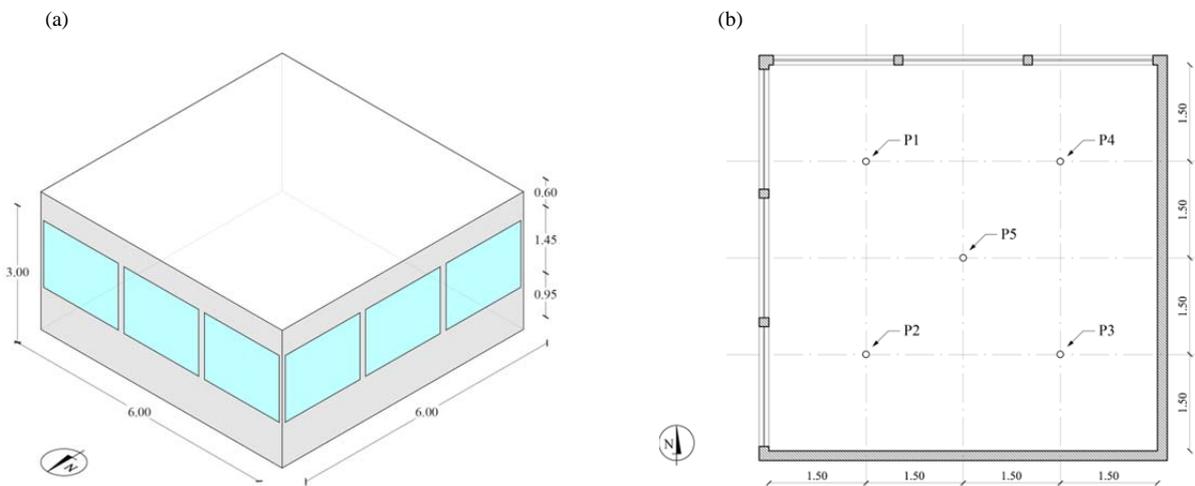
(a) Case study volume, facing north-west. □ External walls. □ Windows. □ Adiabatic surfaces. (b) Plan of the room and its measurement points.
